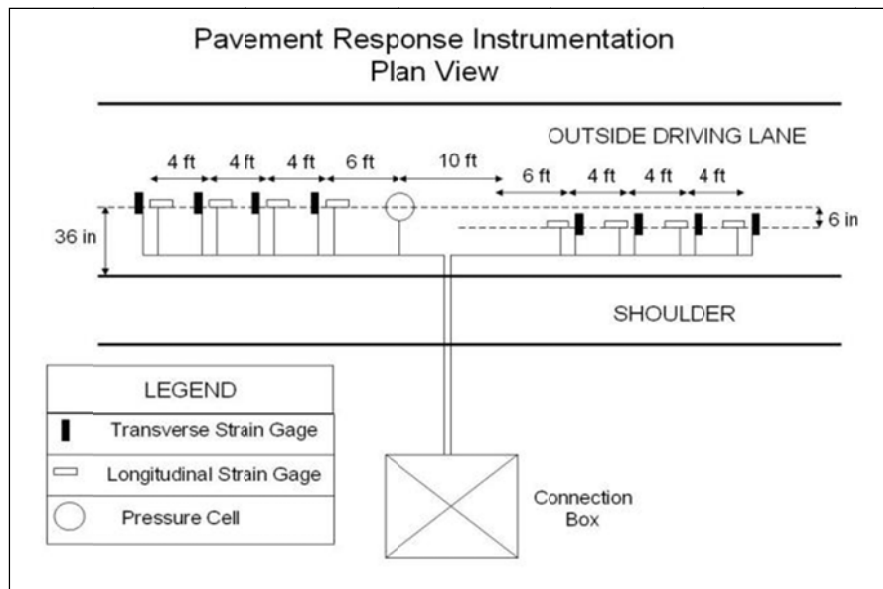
Plan view of instrumentation as installed in sections 1, 2, 4.
